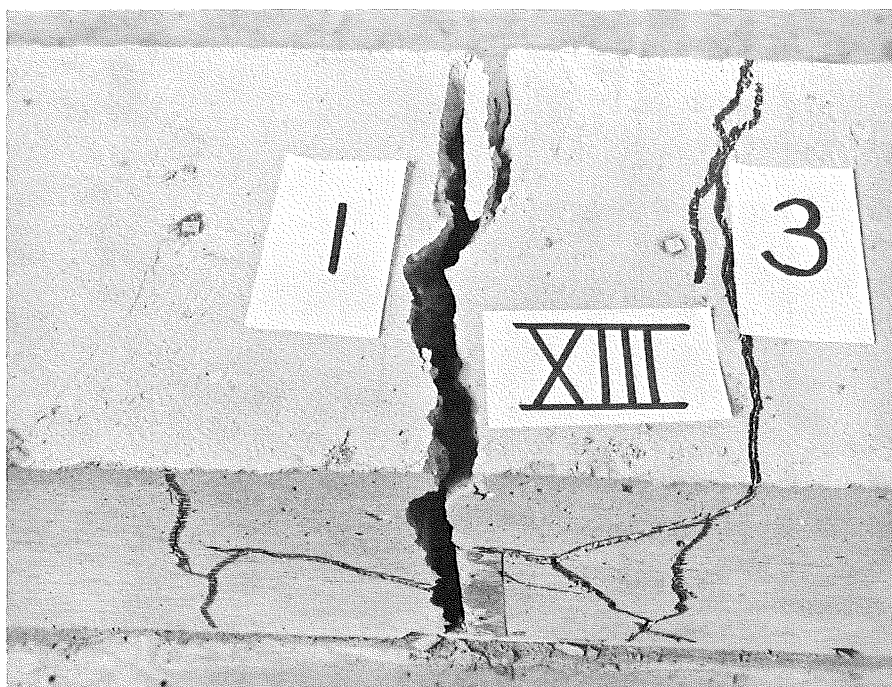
B - FAILURE OF SPECIMEN XIII (SET E)
